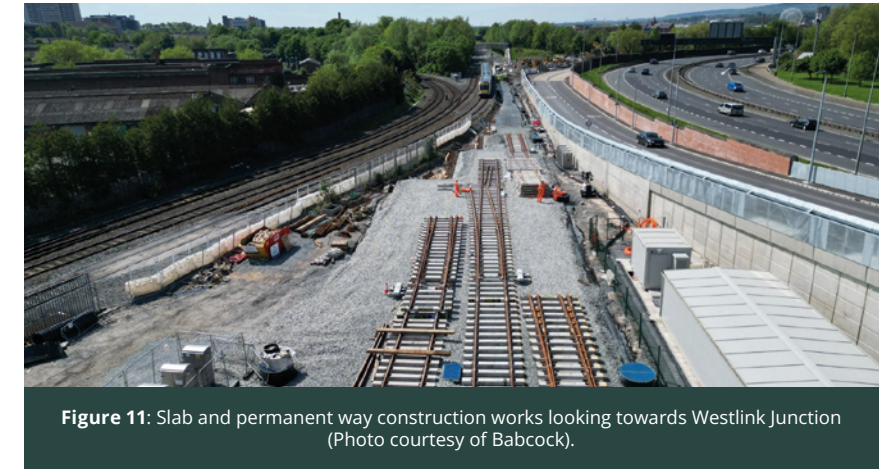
Slab and permanent way construction works looking towards Westlink Junction (Photo courtesy of Babcock).
